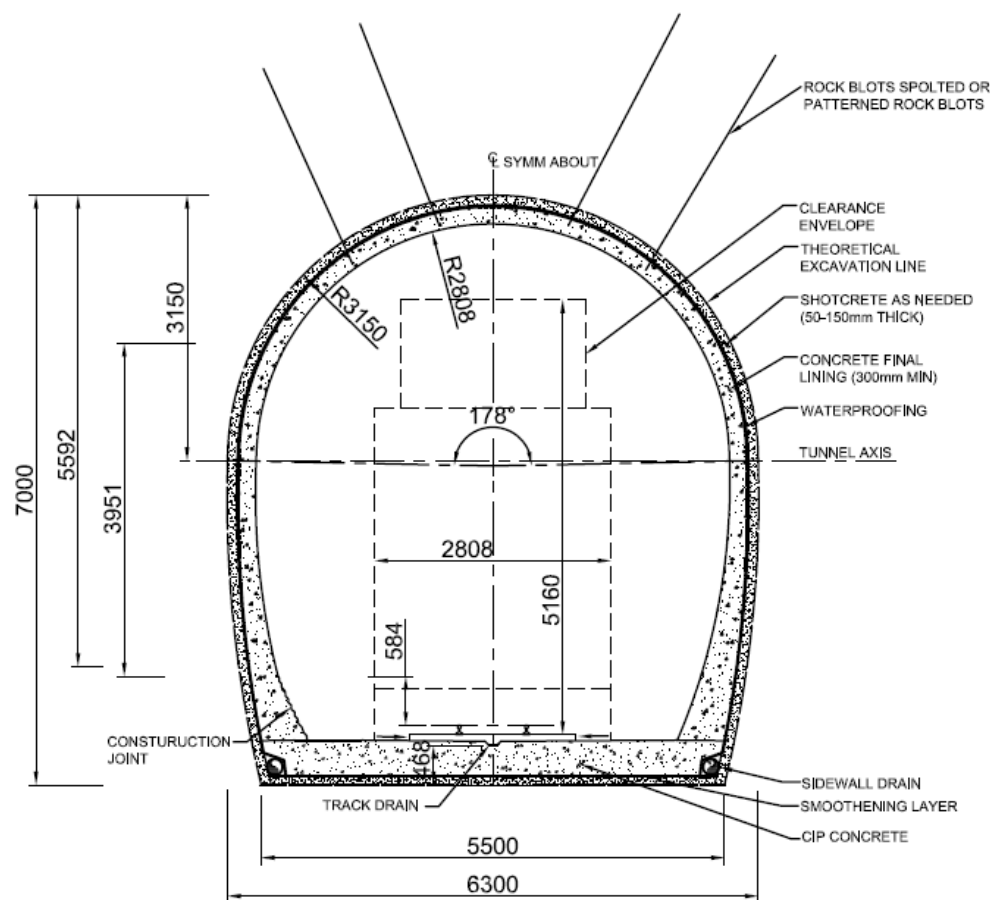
Cross section of semicircle tunnel constructed by drill and blast
